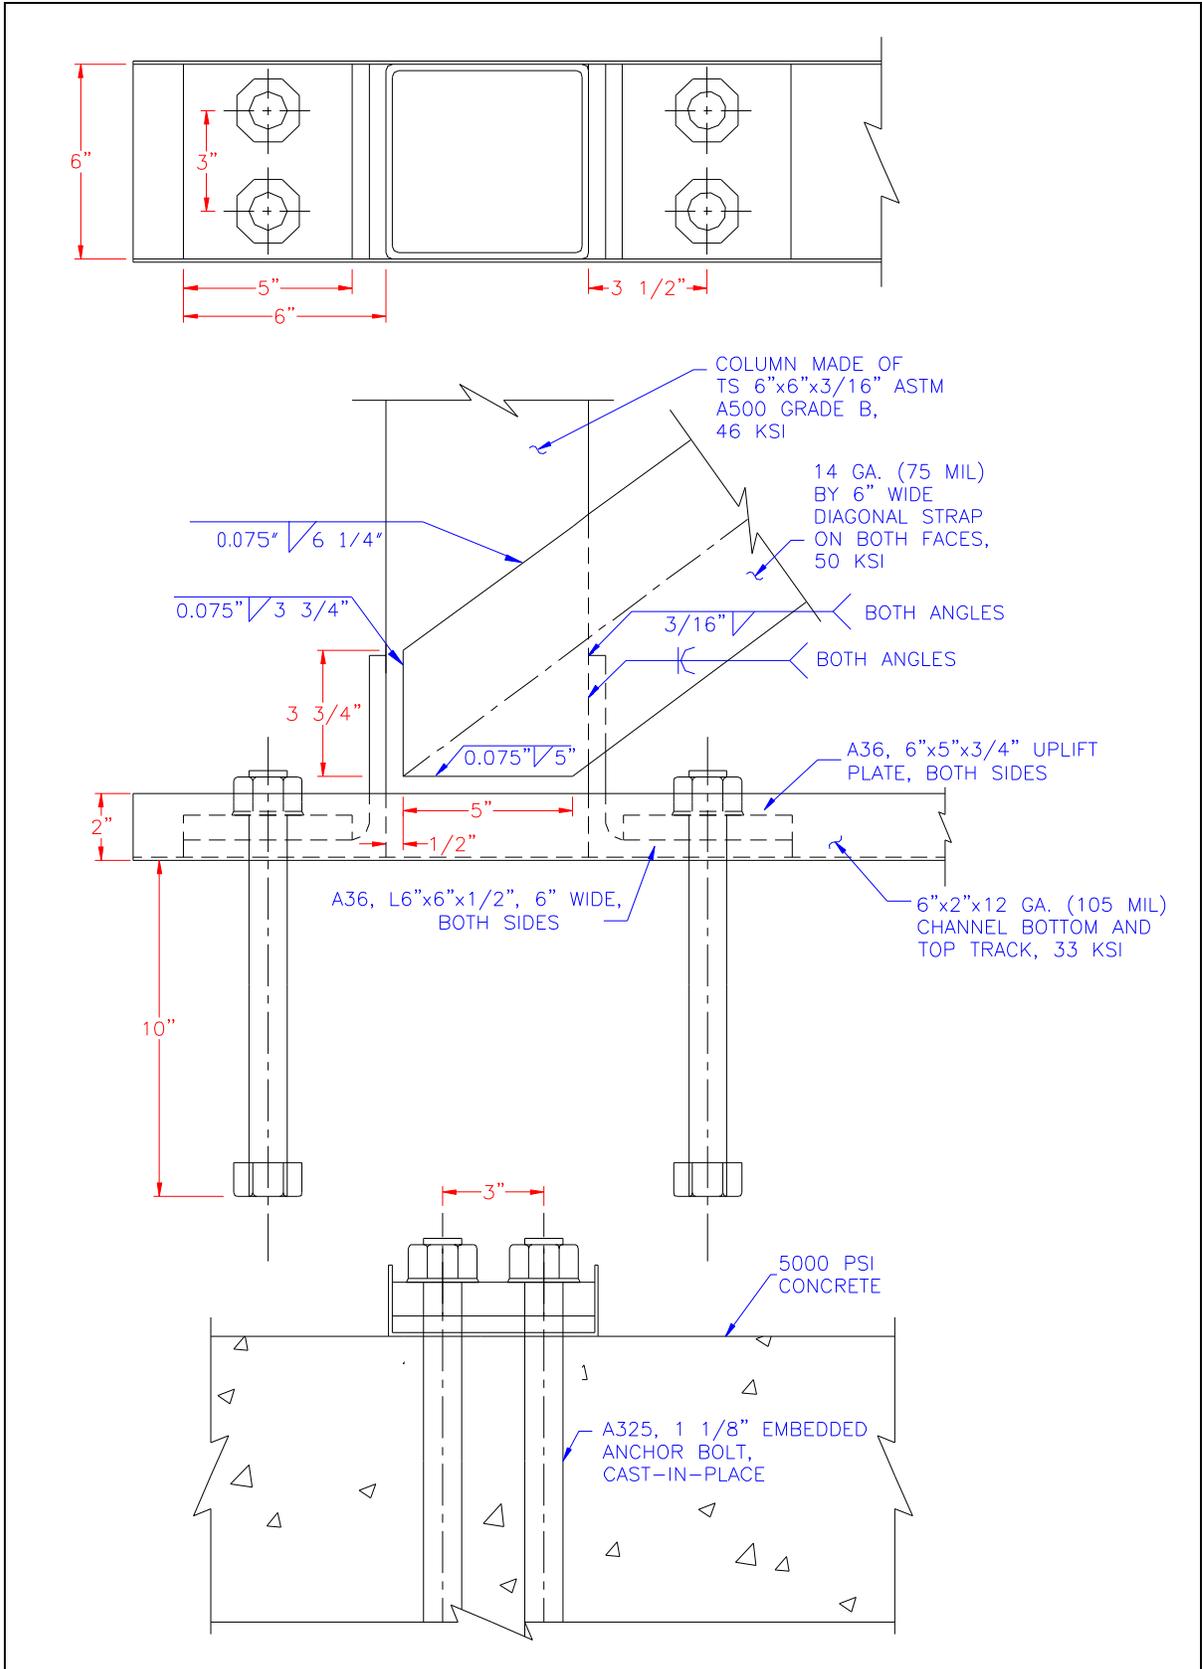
Example connection/anchorage detail - 6th row of Tables D-5, D-8 - D-17.
